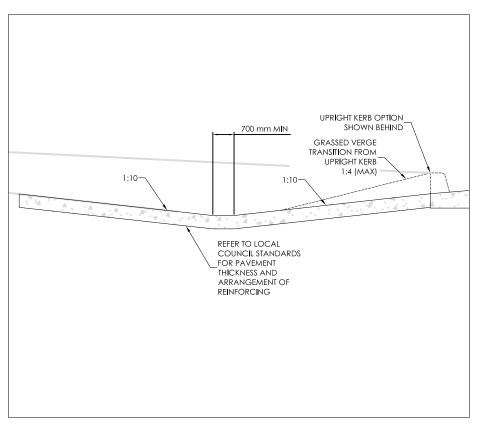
TYPICAL DRIVEWAY CROSSING
